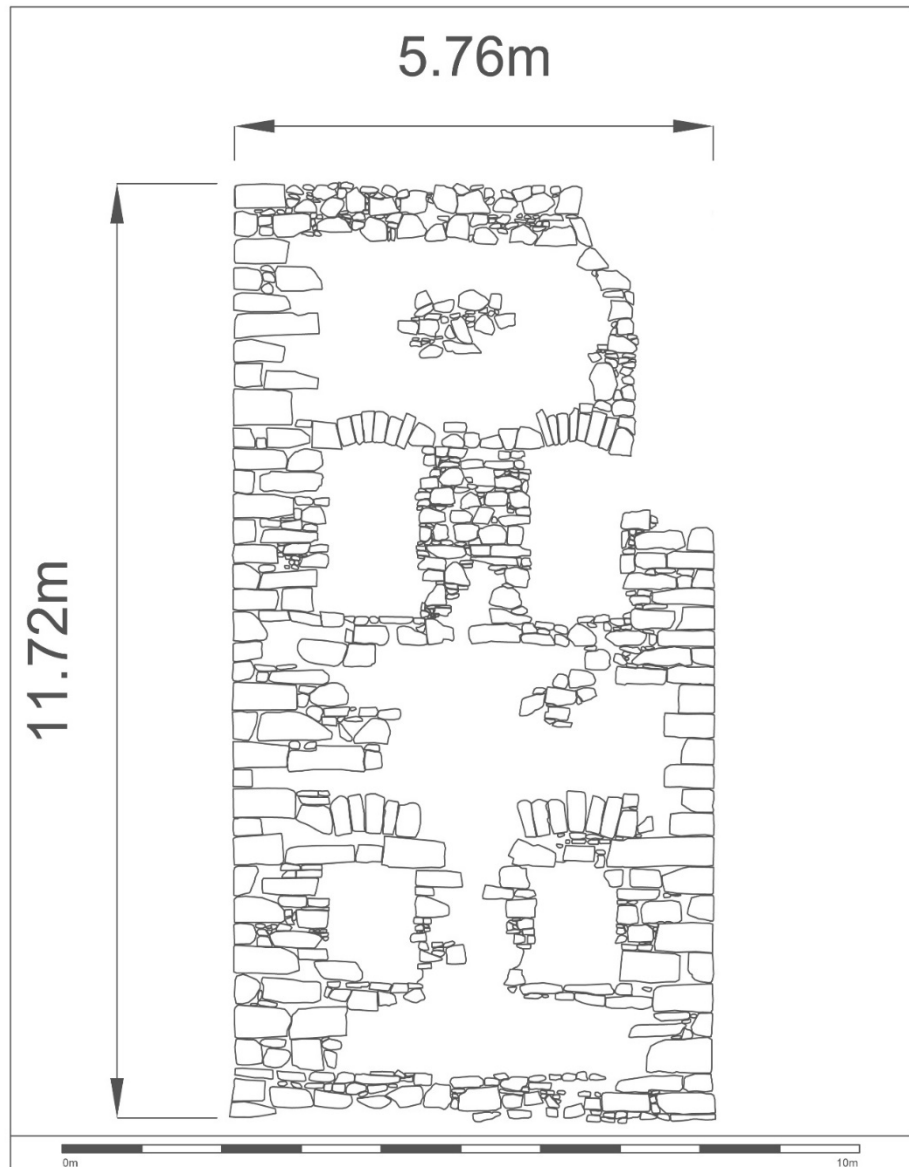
External elevation of the north-east wall of the signal tower at Mullaghderg Hill Signal Station.
